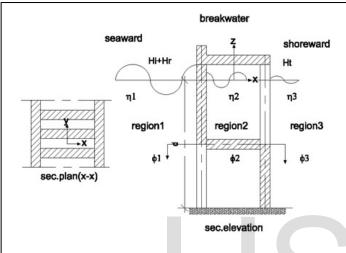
Sketch for a vertical perforated wall breakwater with horizontal slot
